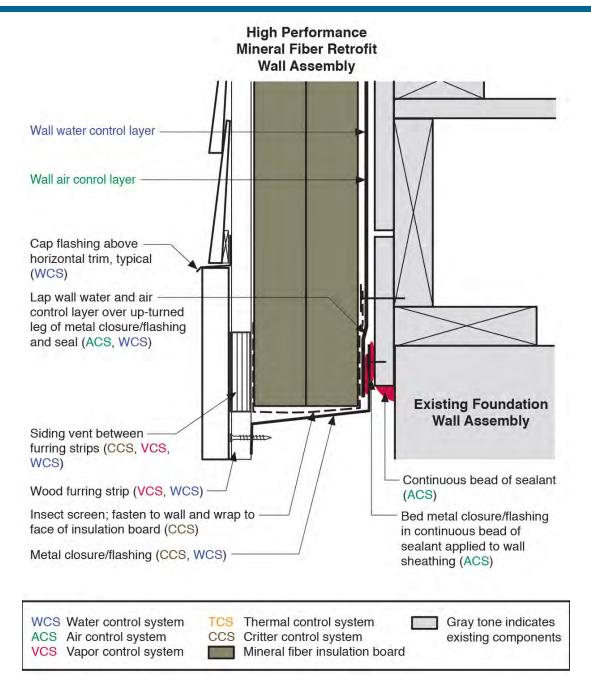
Schematic detail for transition from a high performance mineral fiber retrofit wall assembly to a flat-surface foundation wall without exterior retrofit
